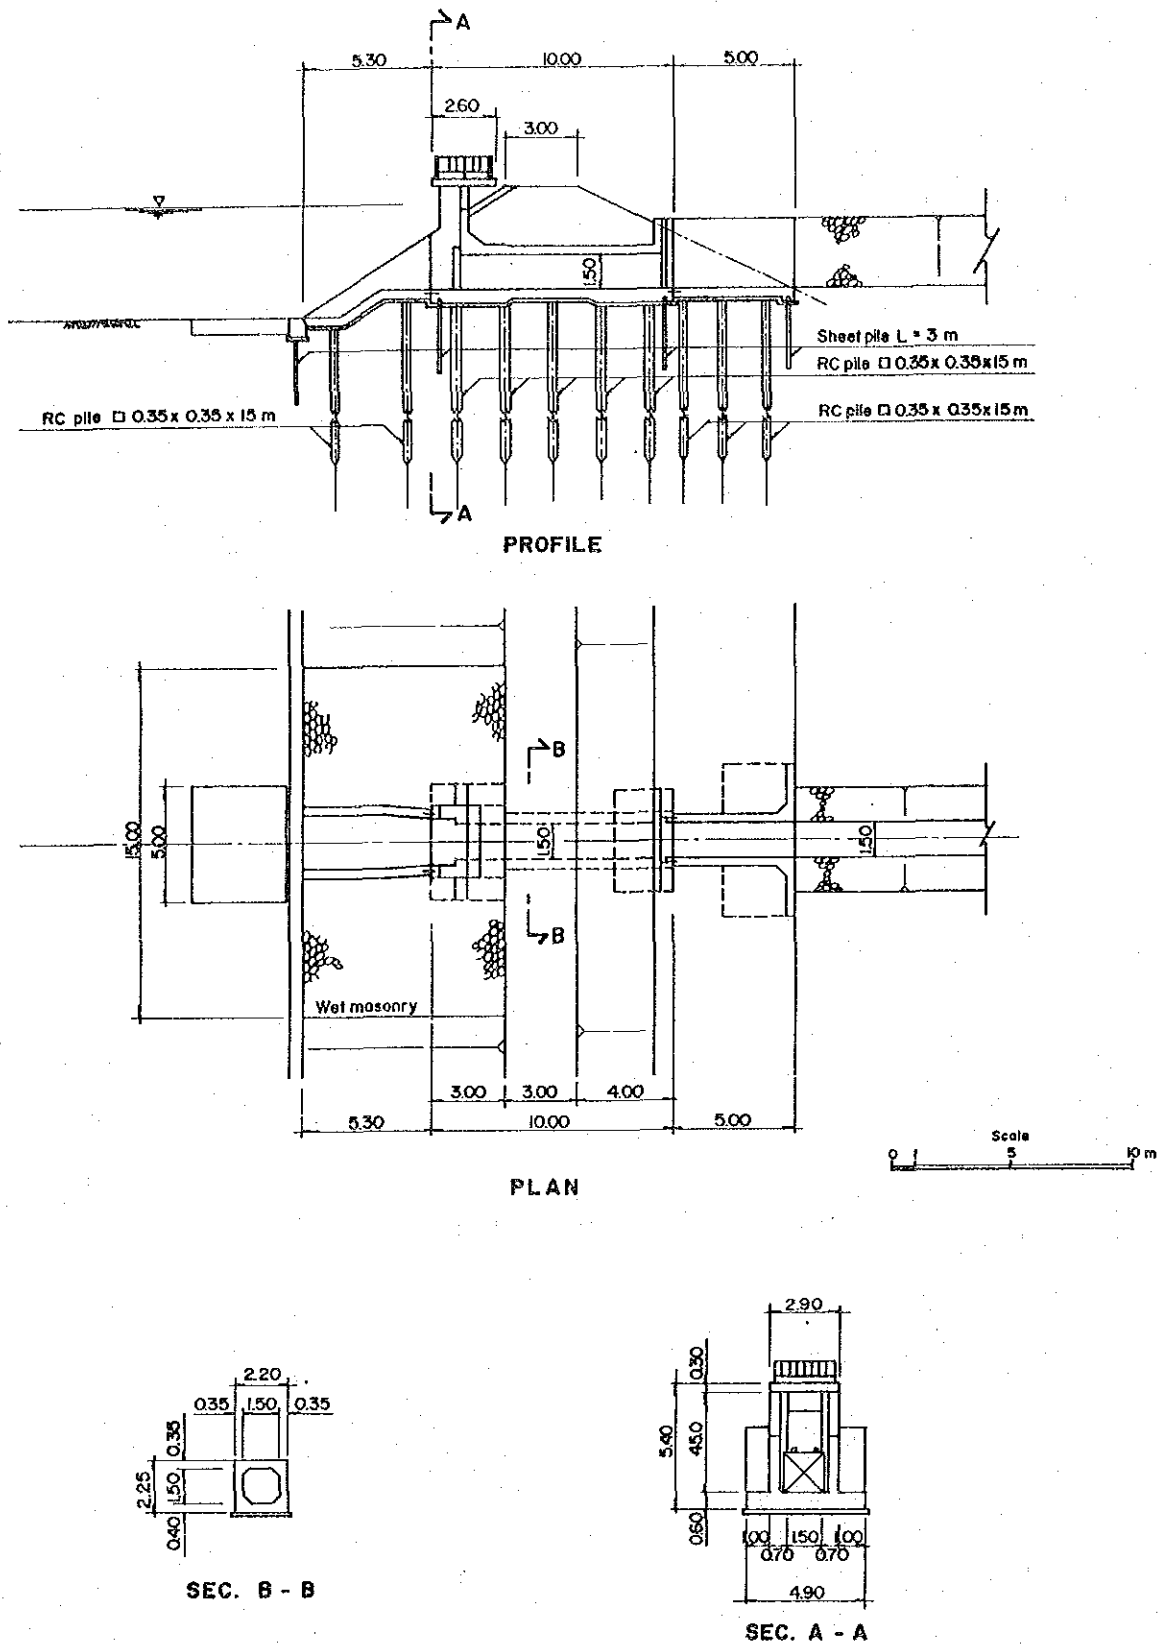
STANDARD DESIGN OF DRAINAGE CULVERT TYPE 1 (1/3)
